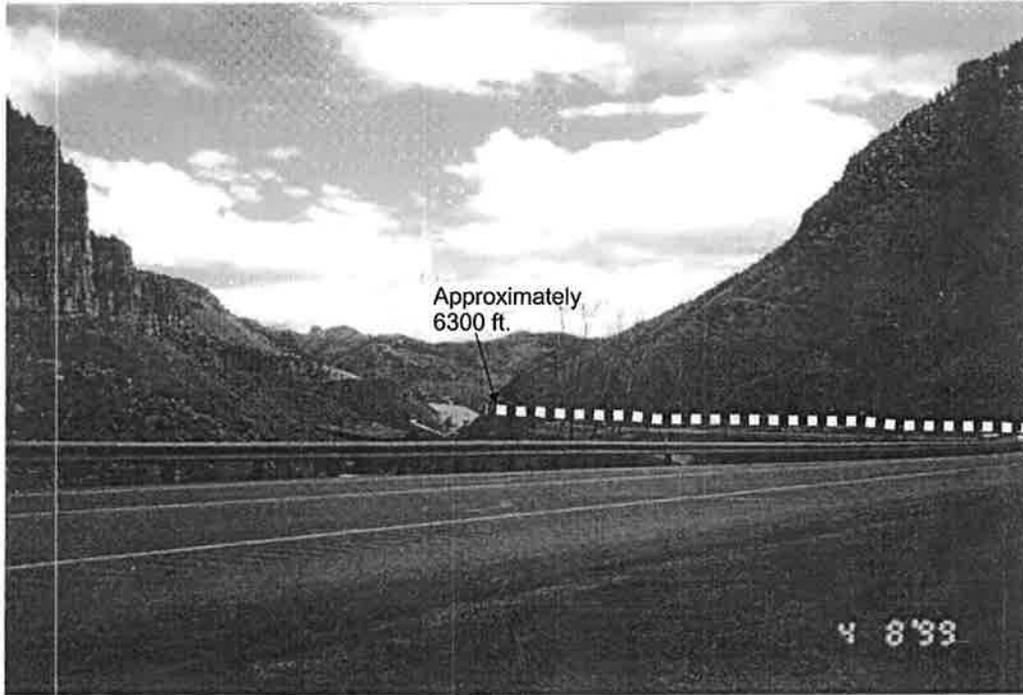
View looking southwest down Price Canyon from the Center of the SW ¼, Sec. 26, T12S, R9E.
